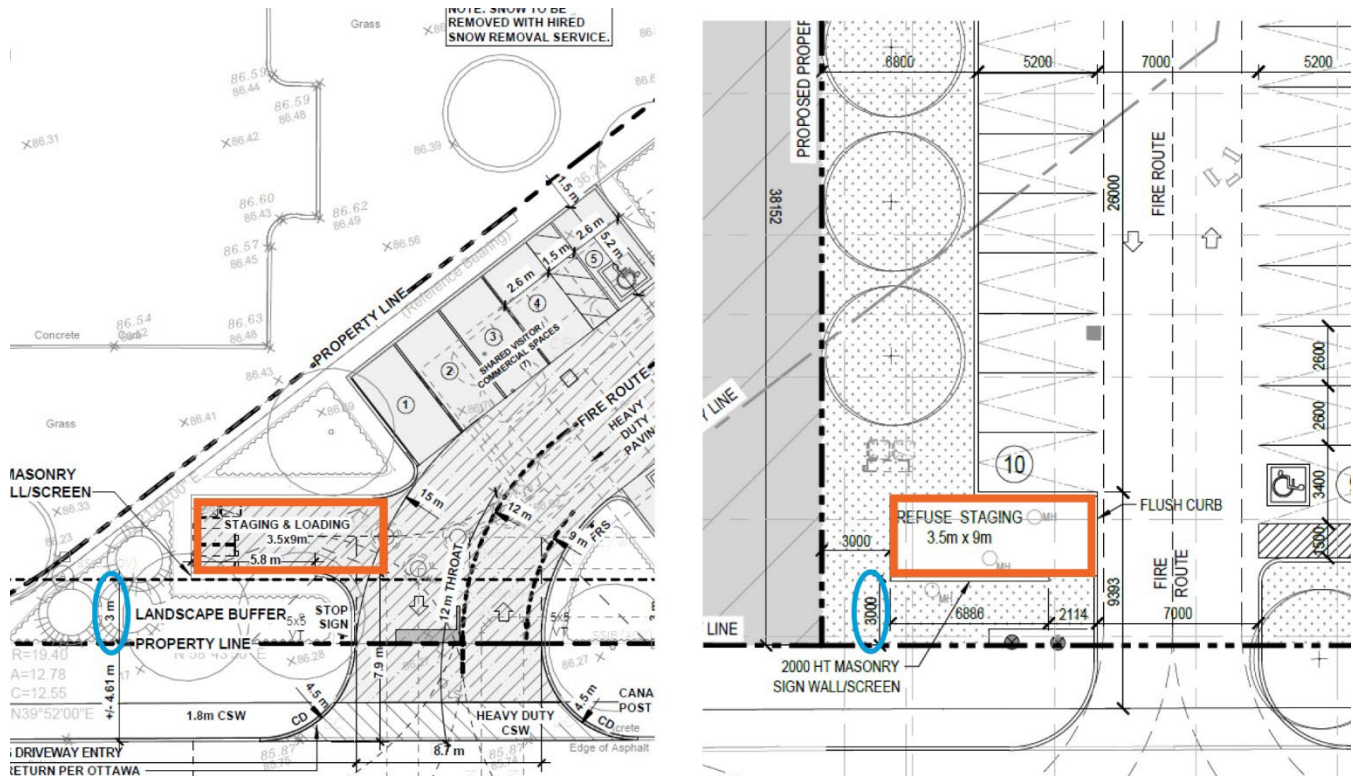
The Approved (left) site plan and the proposed (right) site plan depicting the refuse staging area and the maintained 3-metre buffer from Gemini Way.
